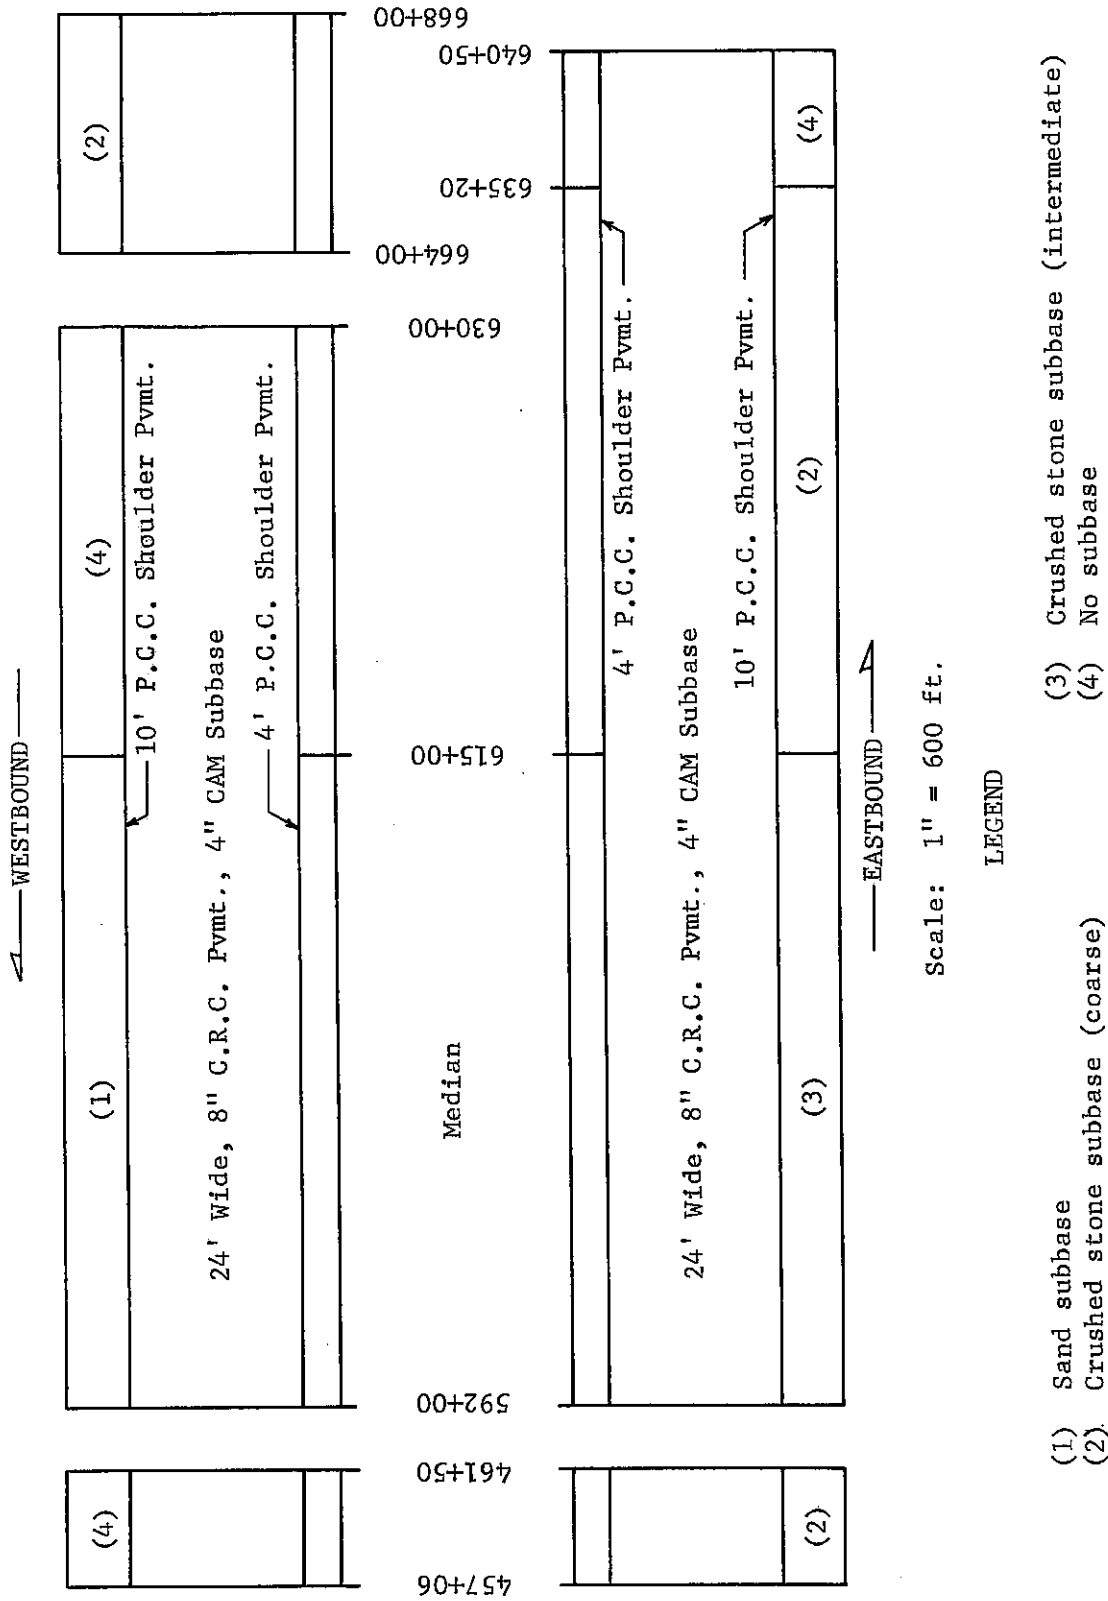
Layout of I-80 portland cement concrete shoulder experiment
